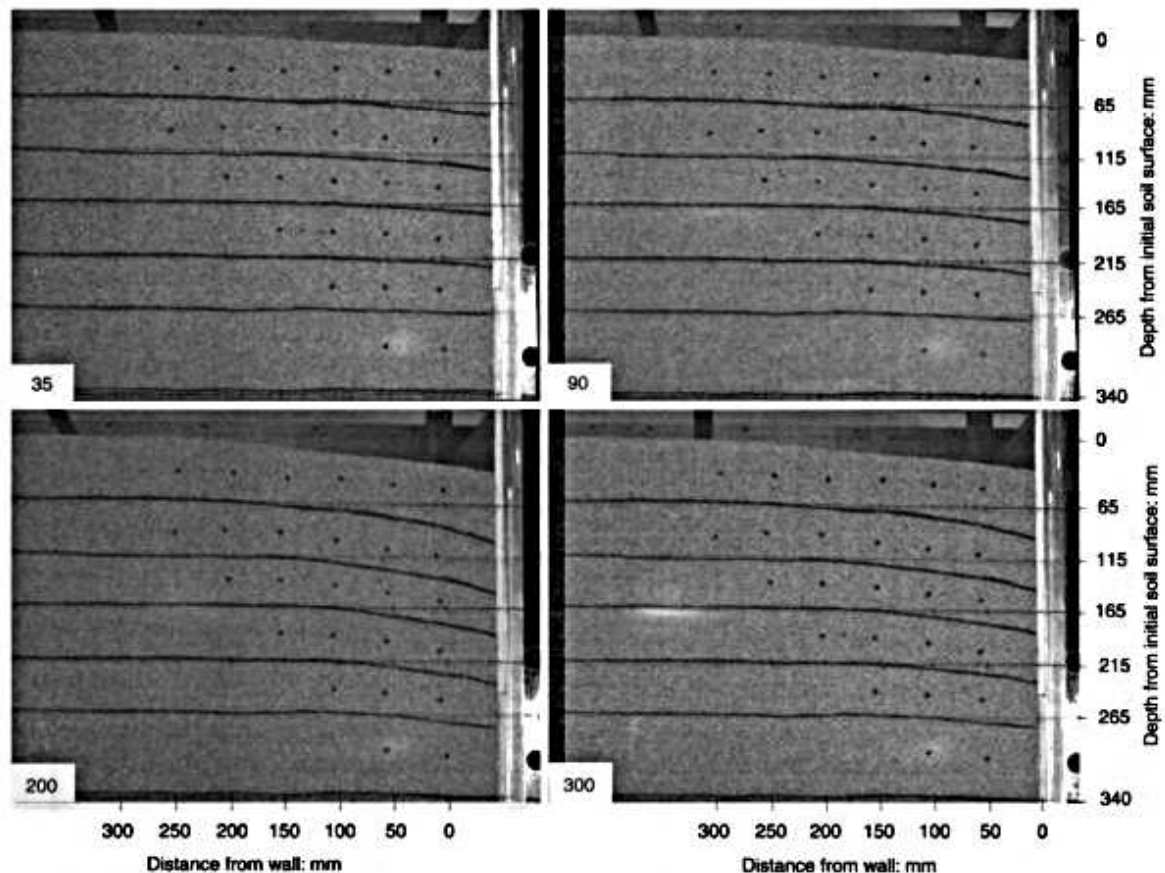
Deformation of Leighton Buzzard backfill material after 35, 90, 200 and 300 cycles of wall rotation for an equivalent 60 m bridge in test SW13 (see Table 4.2). The wall is in the datum vertical position
